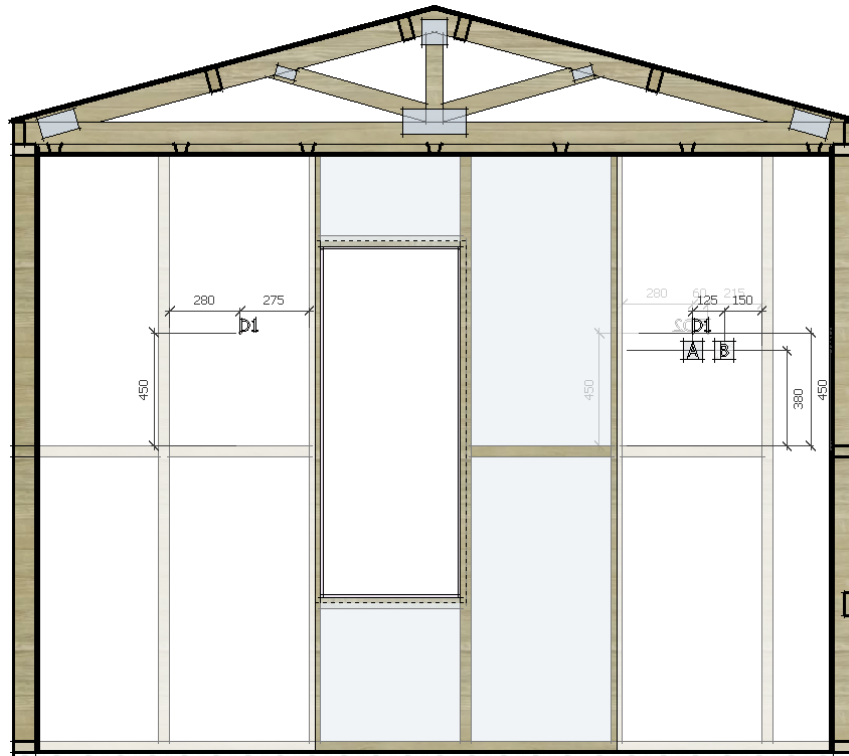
Experiment #2 general location of thermocouples on fixed end wall lining (viewed from inside)
